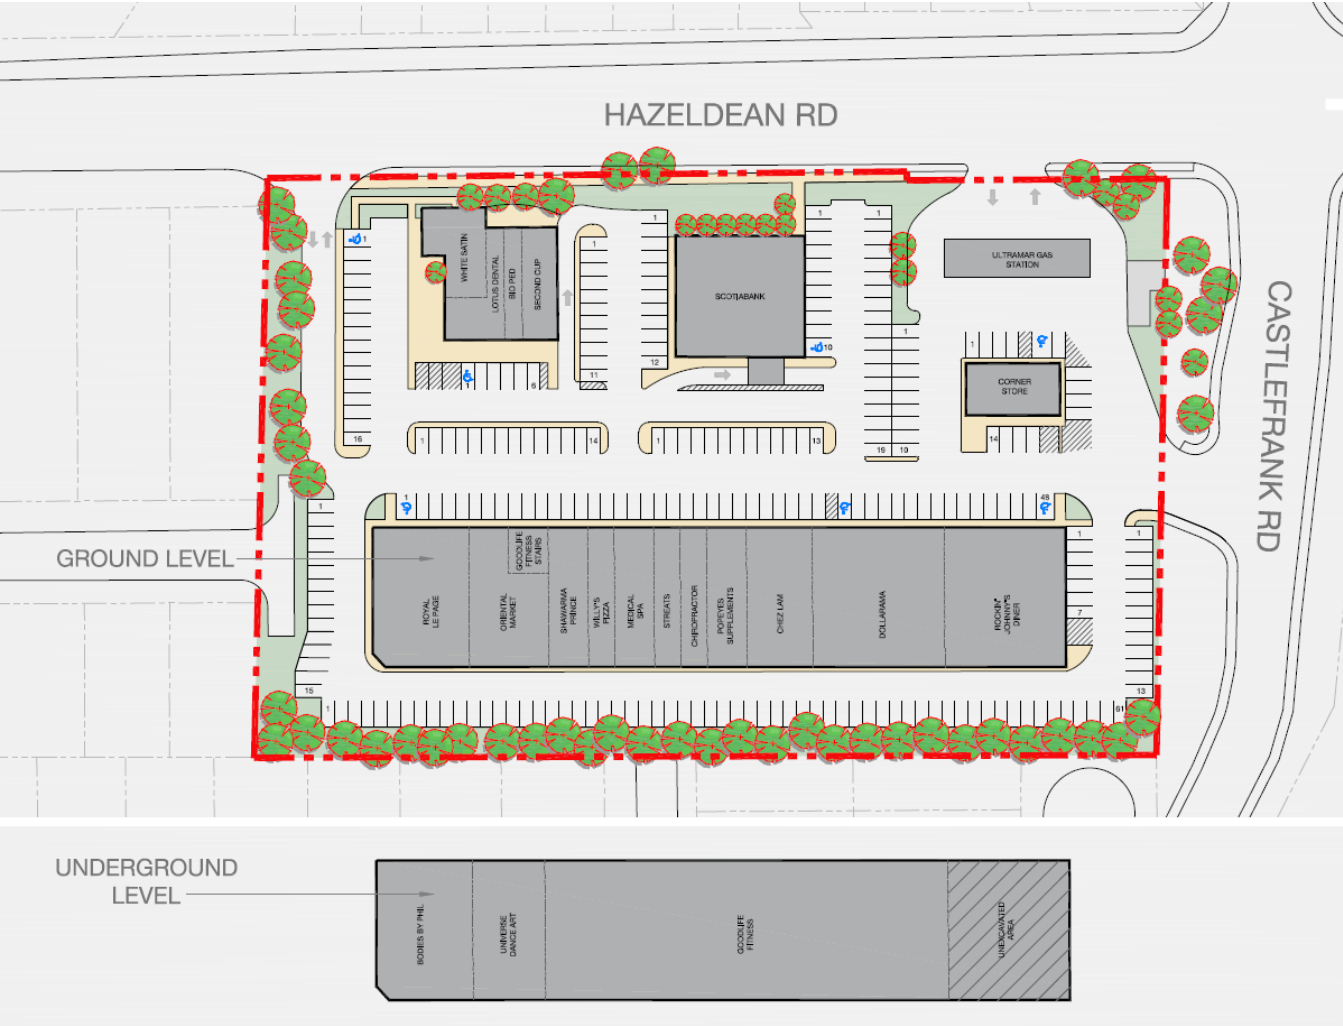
Site plan and current uses of the commercial buildings located at 484 Hazeldean Road.
